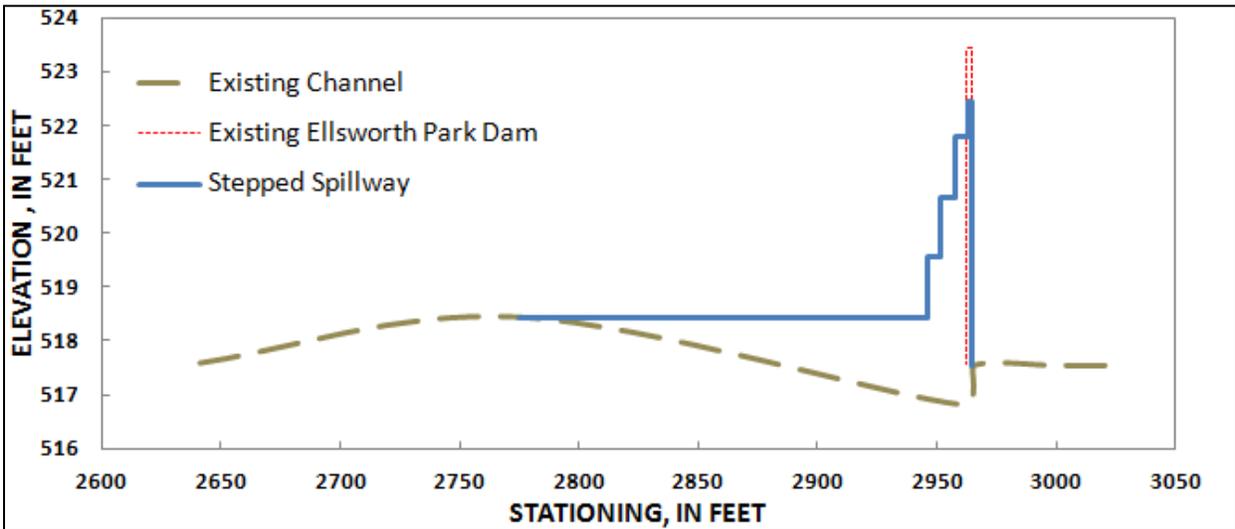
Ellsworth Park Dam Stepped Spillway Profile
